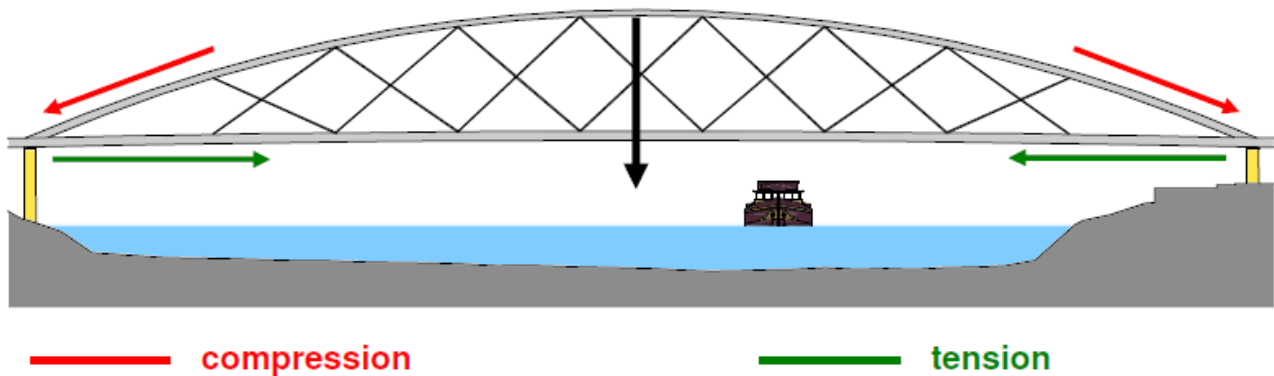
Bowstring Bridge Scheme - Compression and Tension Forces in the Structural Elements - (Gens F. , Design and Construction of Bridges - Chap 03b-2 - Bowstring Bridges, 2024)
